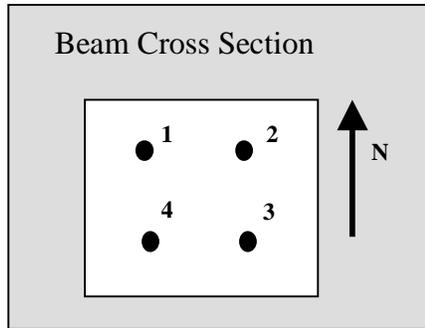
Cross Section of the Test Beam Relative to the Top End of the Beam
